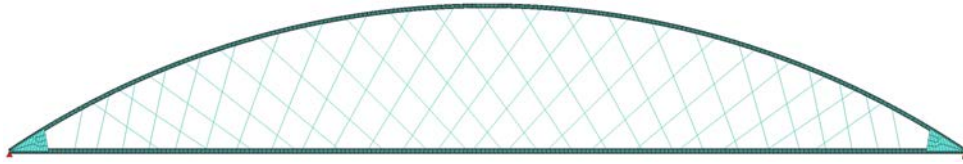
The used model of the Network Arch Bridge in Cracow
